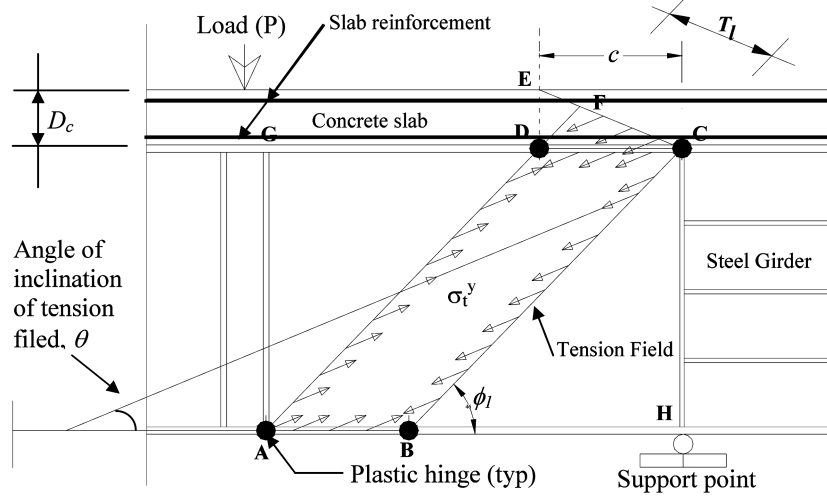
Assumed failure mechanism for composite plate girders under shear loading
